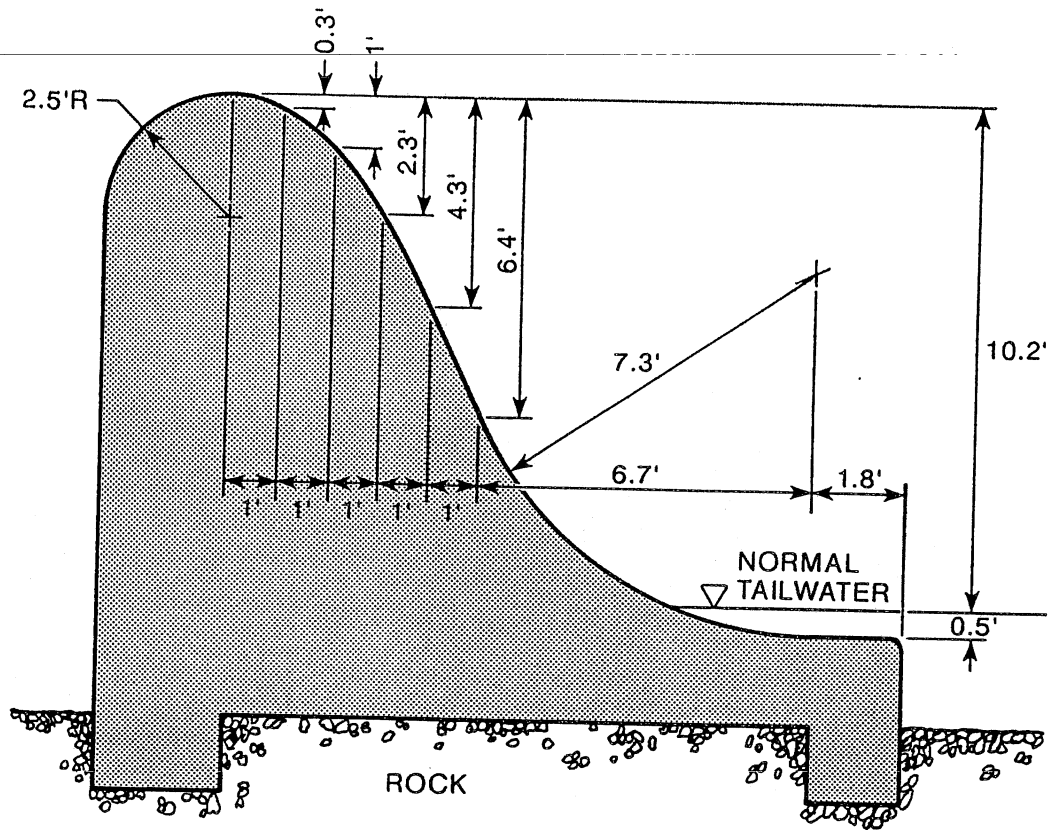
Faribault Woolen Mill Dam original cross section.
